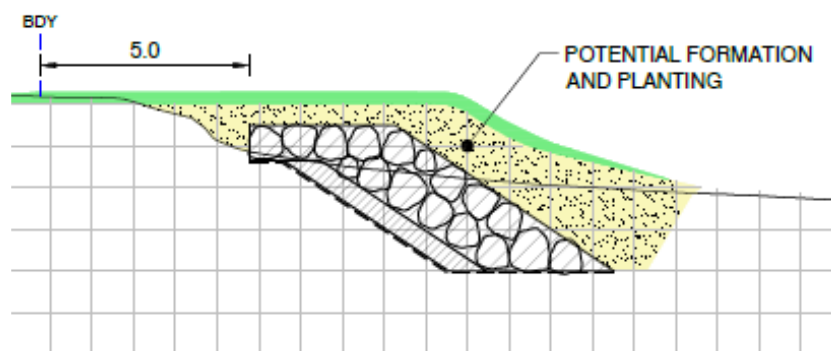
Southern Wall section (Figure 7.1 from the Construction Methodology Statement, Davis Coastal Consultants, October 2024; page 13).
